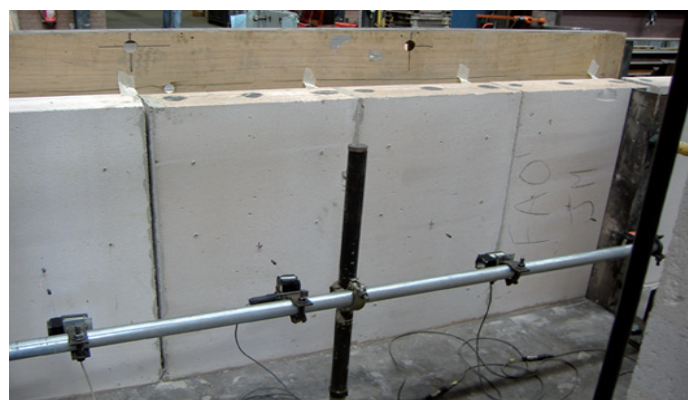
General View of Test Arrangement and Failure of Wall 1 under Horizontal Spanning Test.
